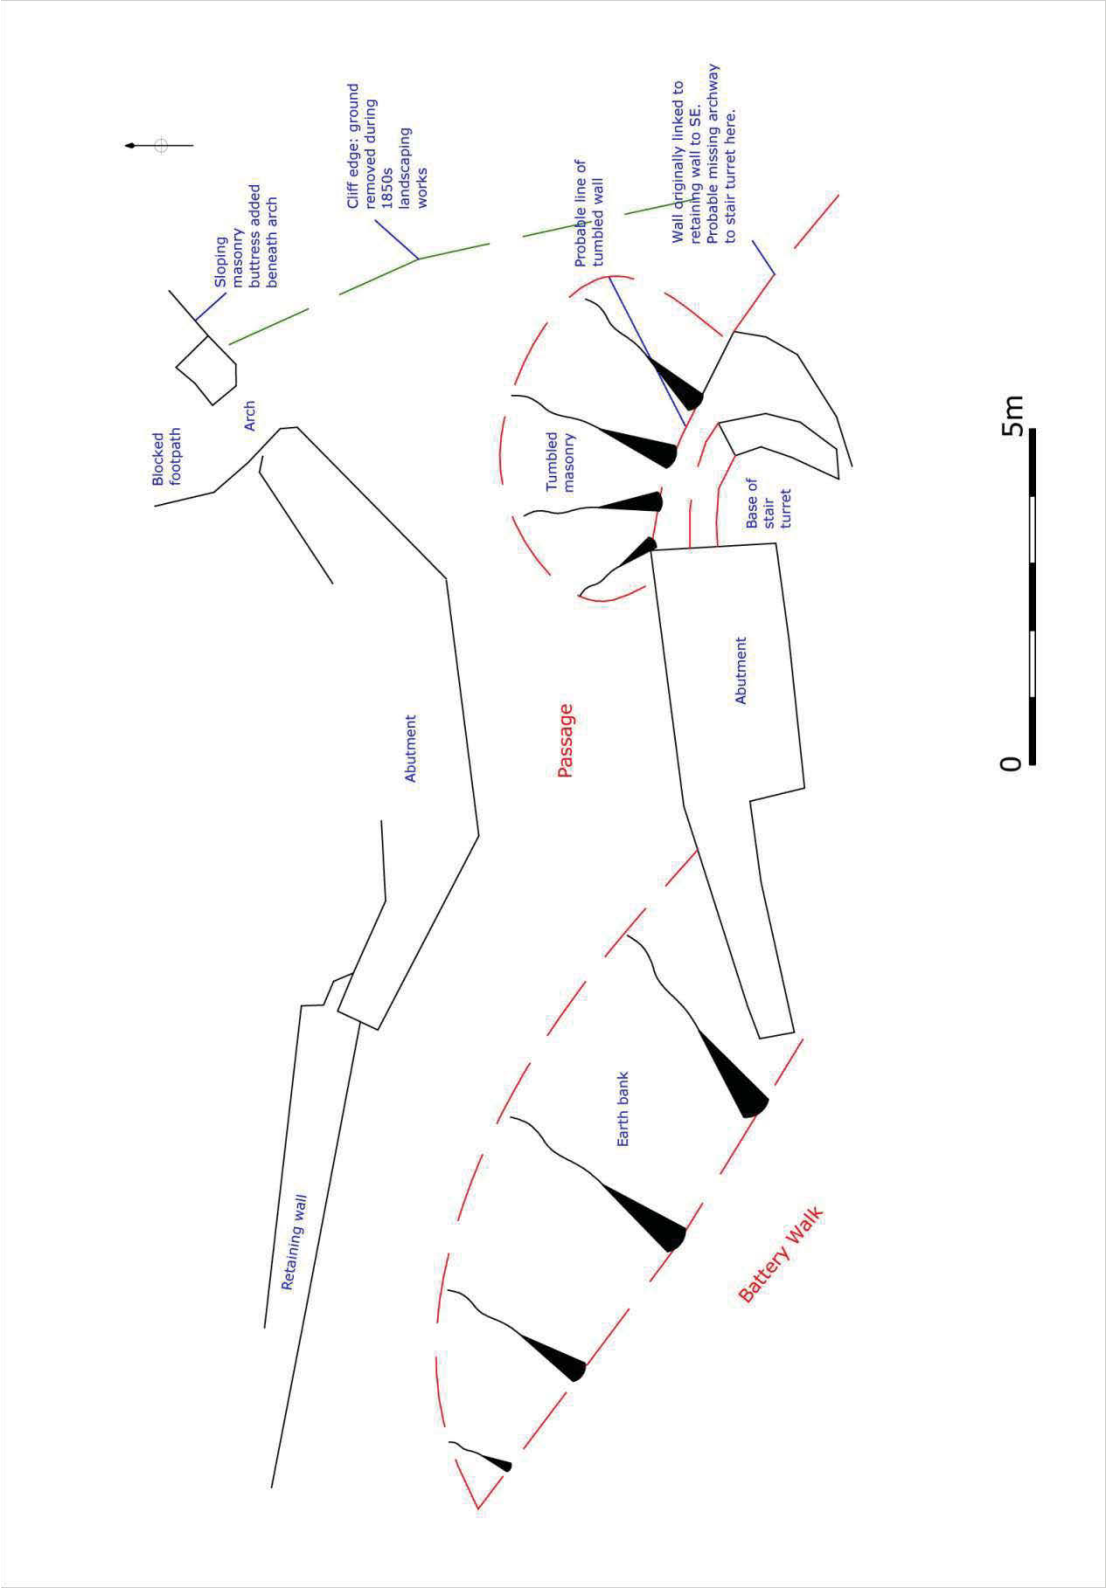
Battery Arch ground floor plan, prior to renovation works.
